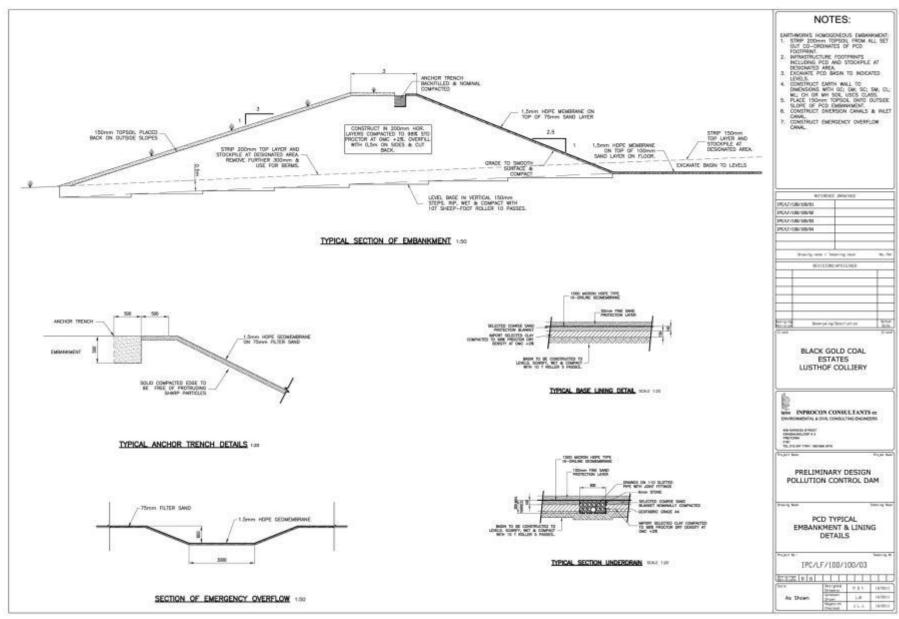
(c): Pollution Control Dam - Typical Embankment and Lining Details.
